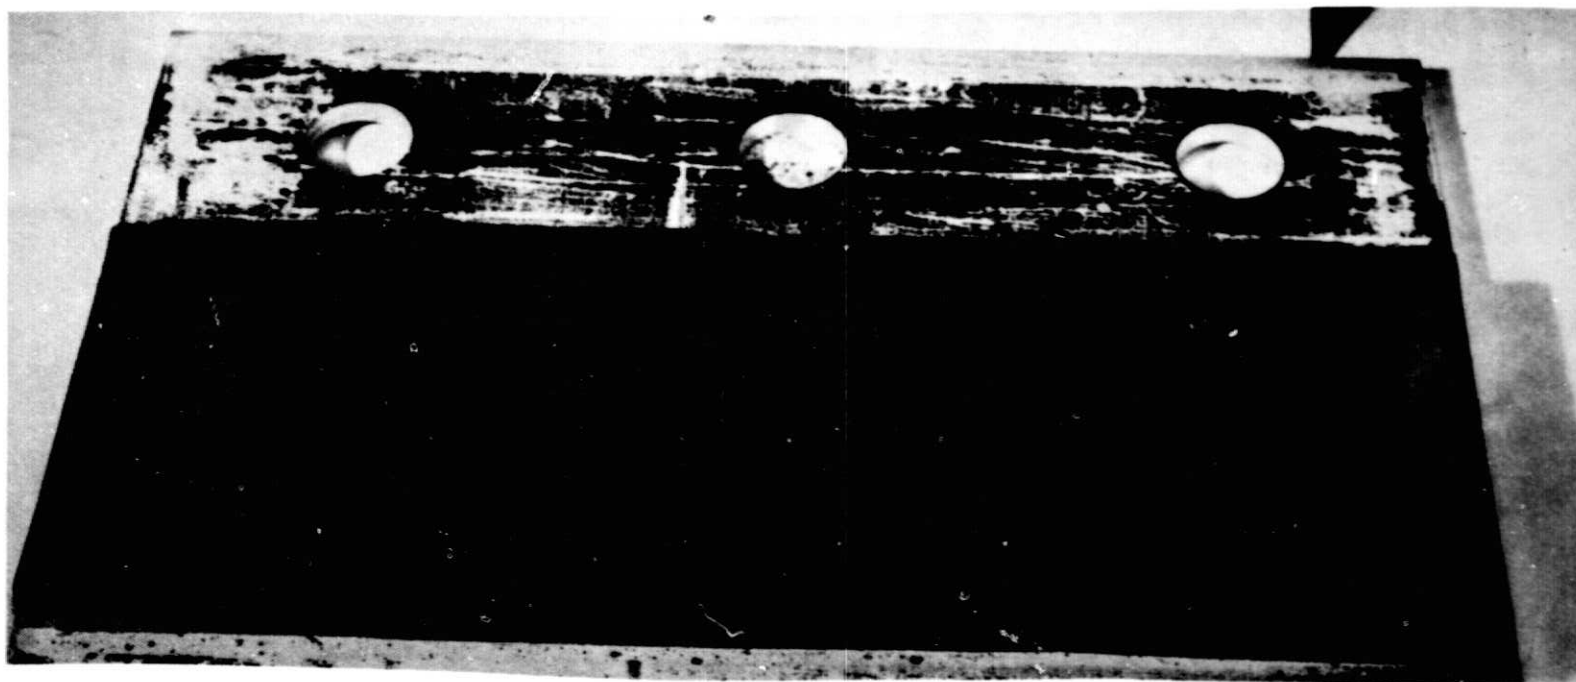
Post-test compressive specimen, 1/4-inch MSA-1, run 39, panel 5.
